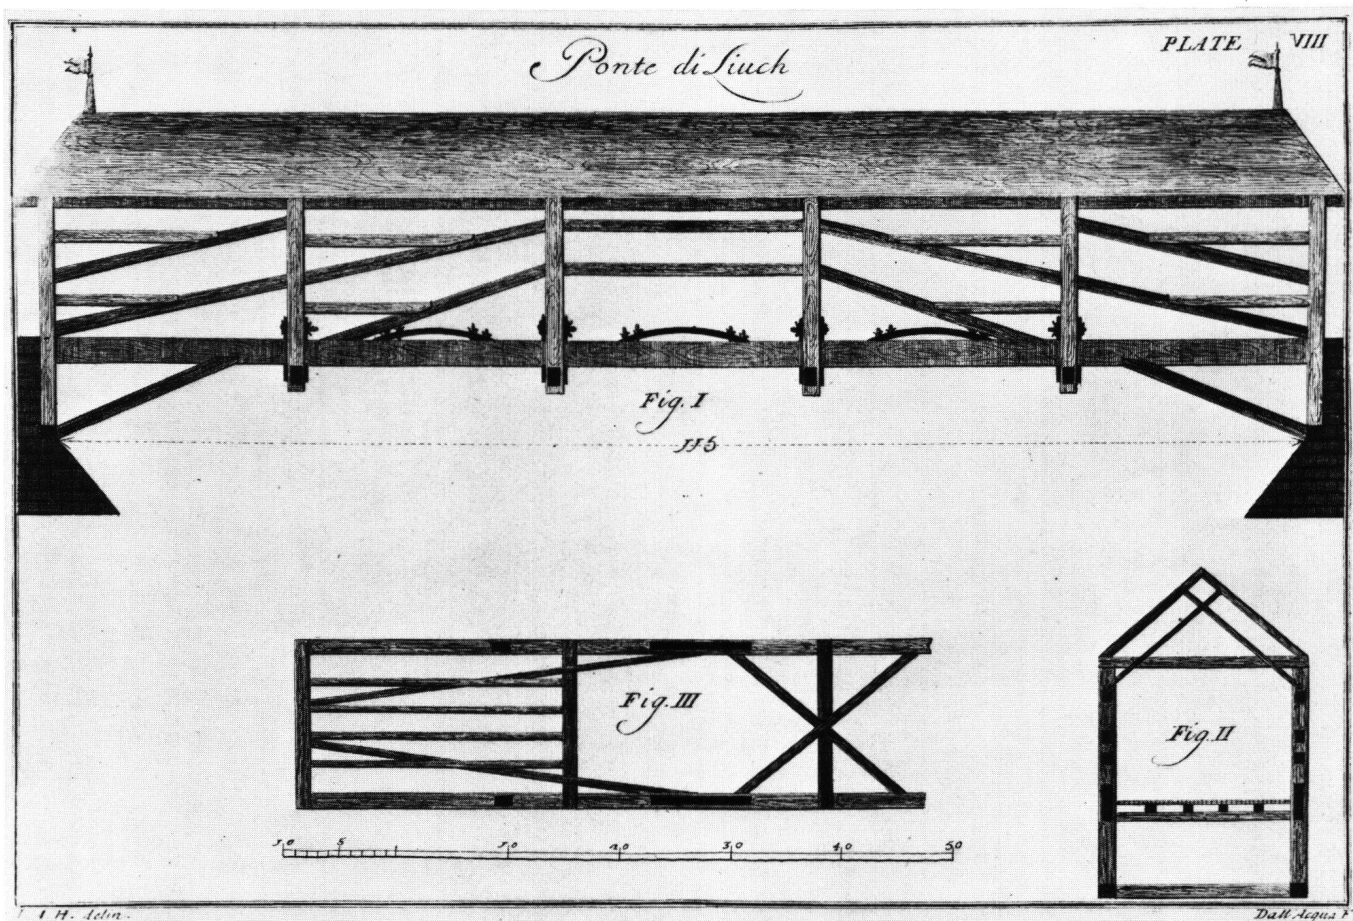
Bridge at Leuk; print after John Augustus Hervey showing plan, elevation and section
